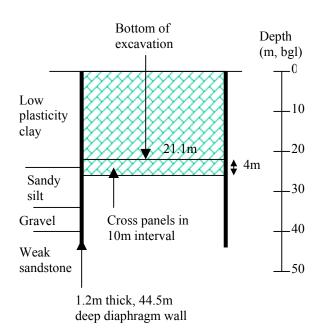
A cross section of the excavation beneath JDB next to BL14 station
